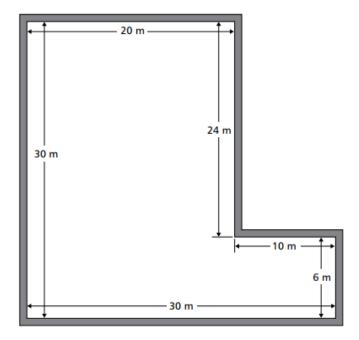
Example 3.4 in CIBSE Section J3.5 indicating the floor area and the floor perimeter is calculated from calculated from the interior surface of the external wall surrounding the floor
